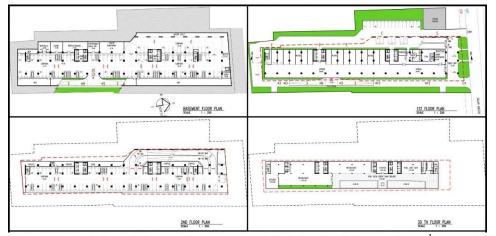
Building design of apartment with office building in the 1st scenario (contd.)
